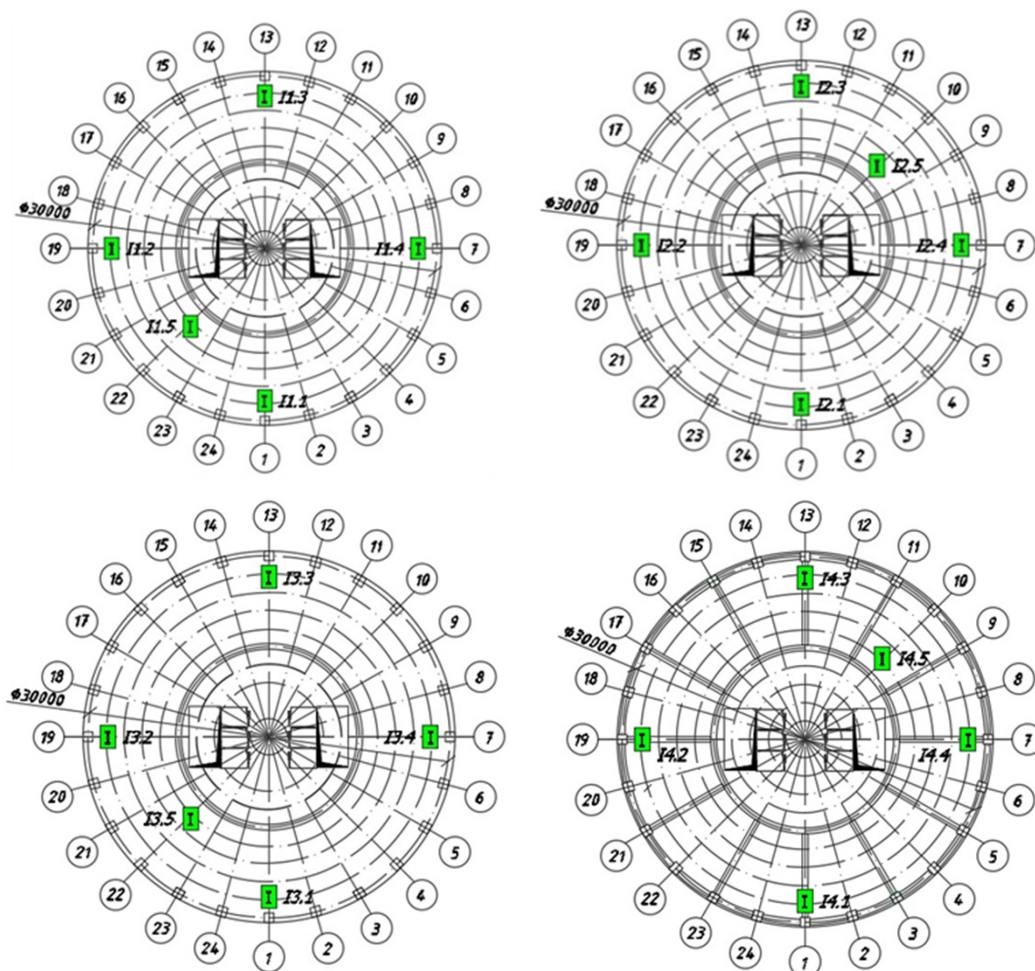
Location of inclinometers for the shell structural system with outrigger floors on 6, 12, 18, 25 floors
